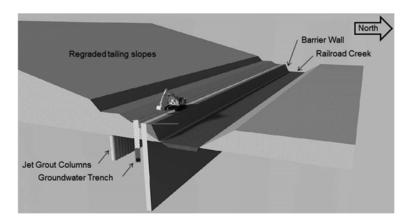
Sketch of Barrier Wall and Collection System at the Holden Mine Site.
